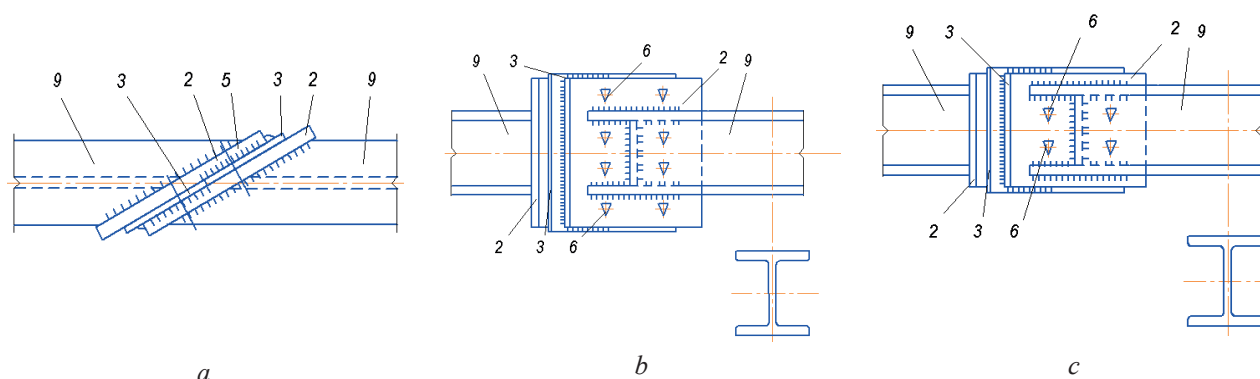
Schemes of flange connections of I-profiles: *a* - top view; *b* – side view; *c* - side view in the absence of bolts in the outer zones of the profile; 2 - oblique flange; 3 - support table; 5 - bolt hole; 6 - coupling bolt; 9 - I-profile
